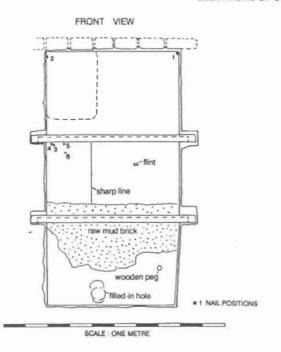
Elevation drawing of Room E, wall E4, with the old hearth II and excavations in sections A & B till in situ clay layers (Vos 2001).
